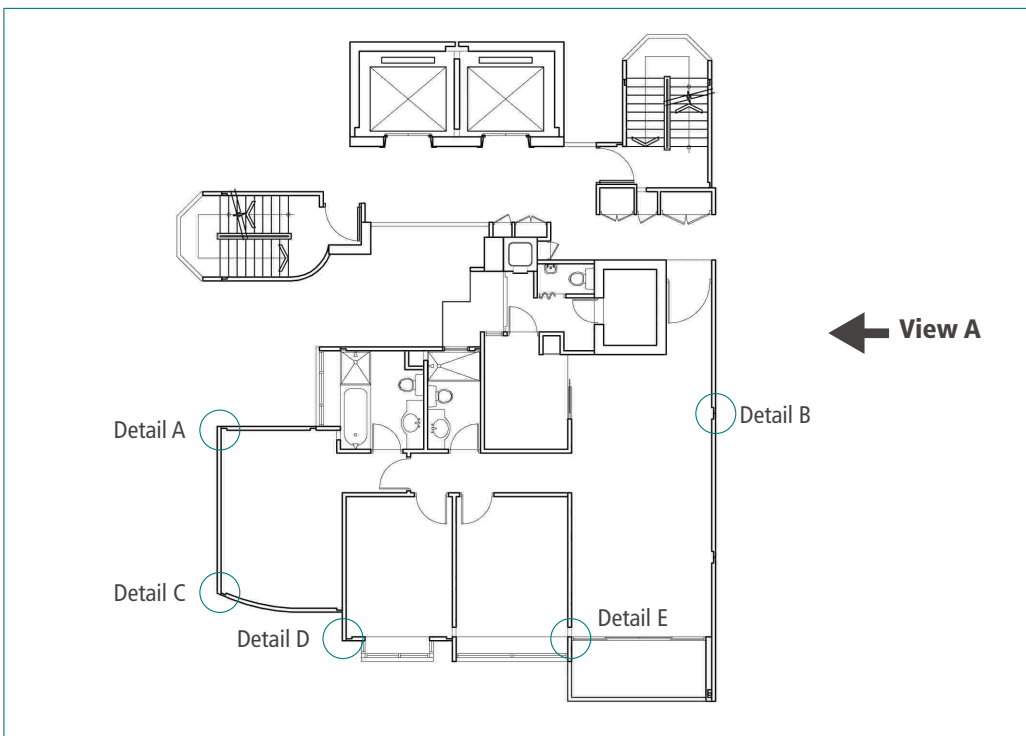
Example of a typical unit using precast façades/ wall panels
